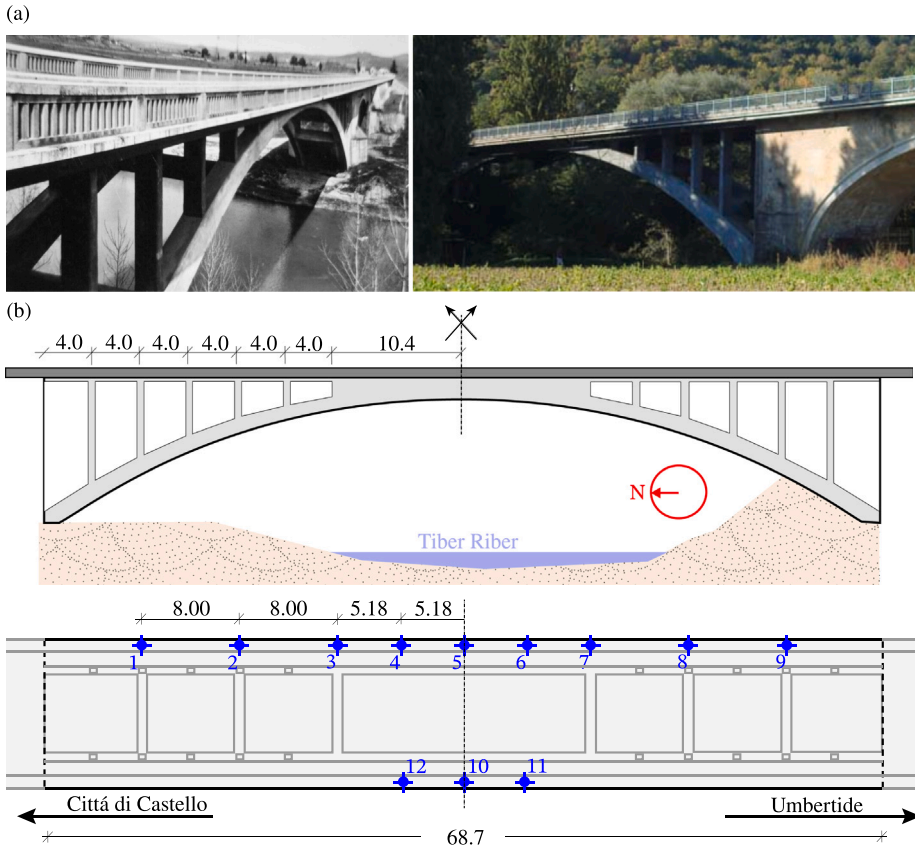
(a) Views of the Montecastelli Bridge (left: photograph from 1955, Source: paesi.altervista.org; right: photograph from 2012, Source: [64]). (b) Plan and elevation views of the Montecastelli Bridge with the sensors layout (dimensions in m).
